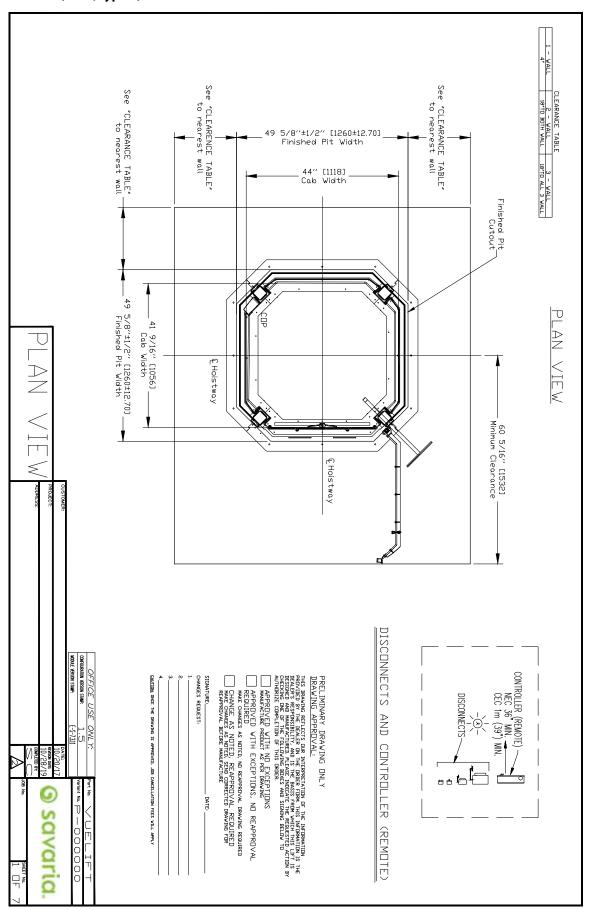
Pit/bottom floor/thru-floor view (OAM, type 1)
